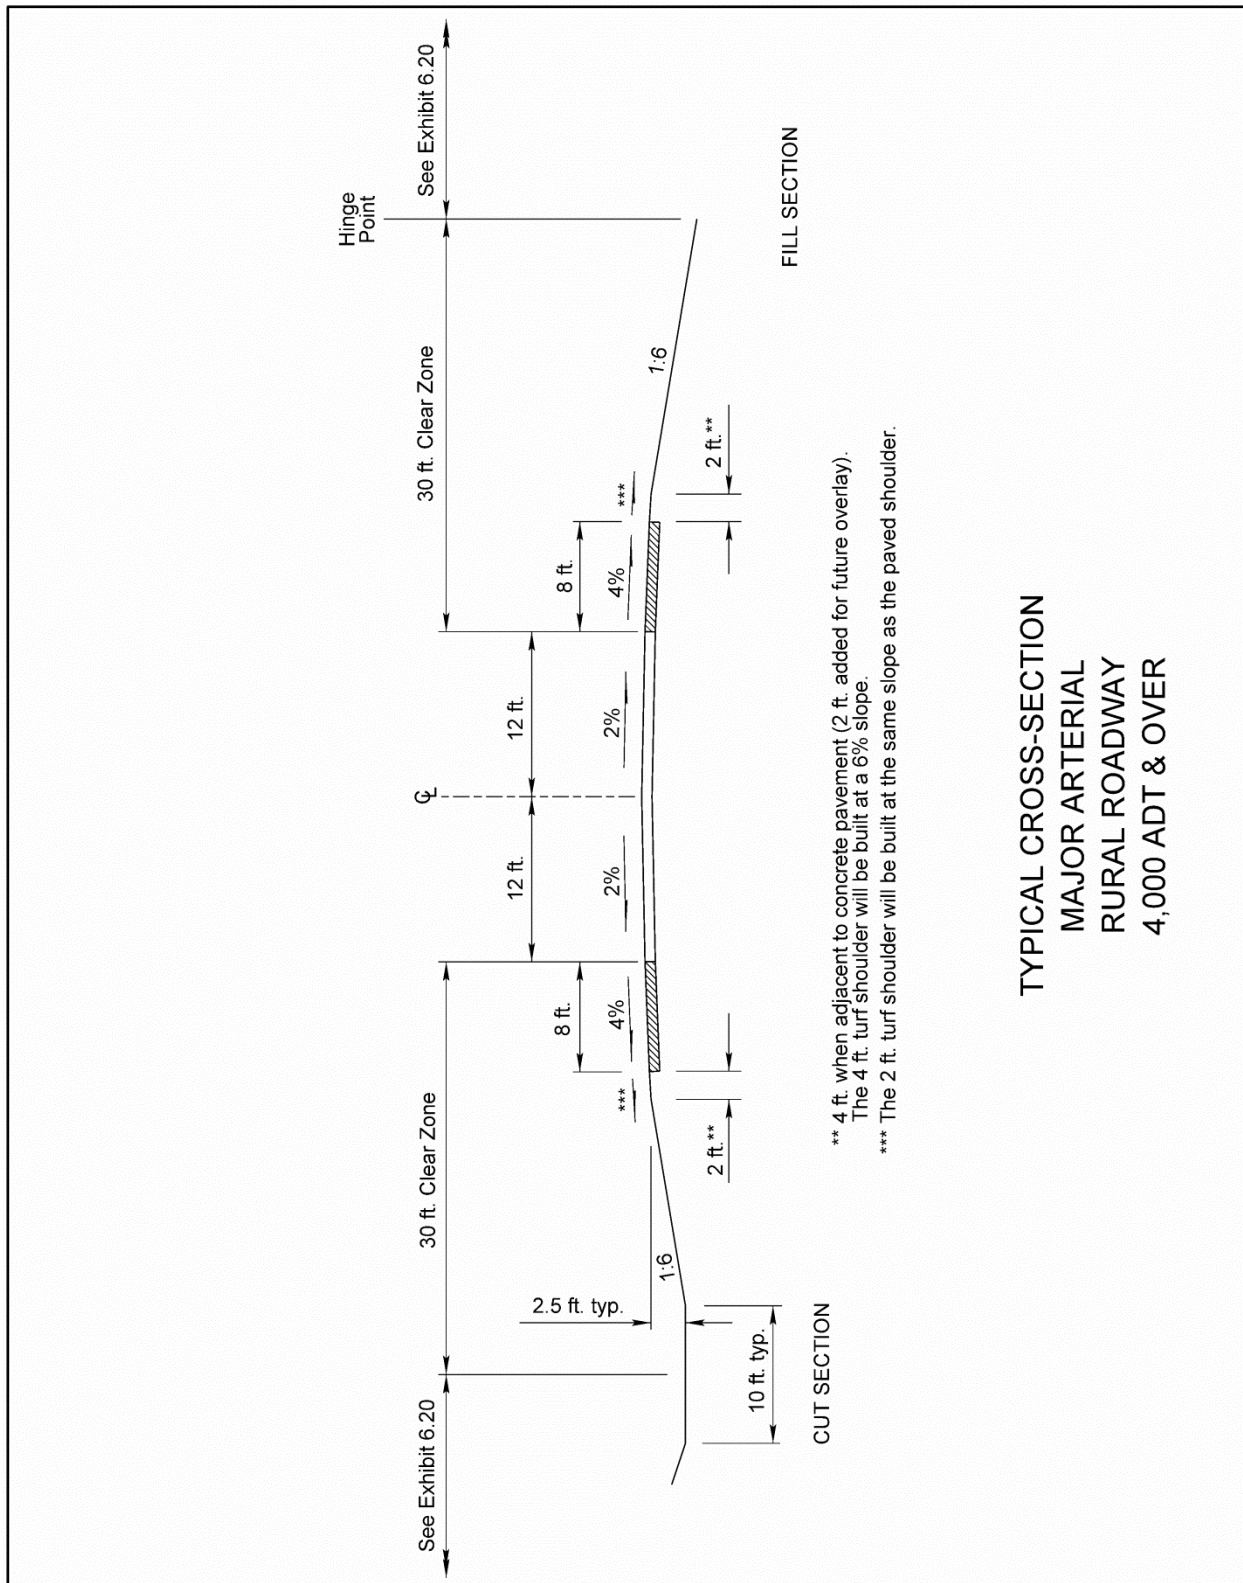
Typical Section - Rural Major Arterial 4,000 ADT and Over
